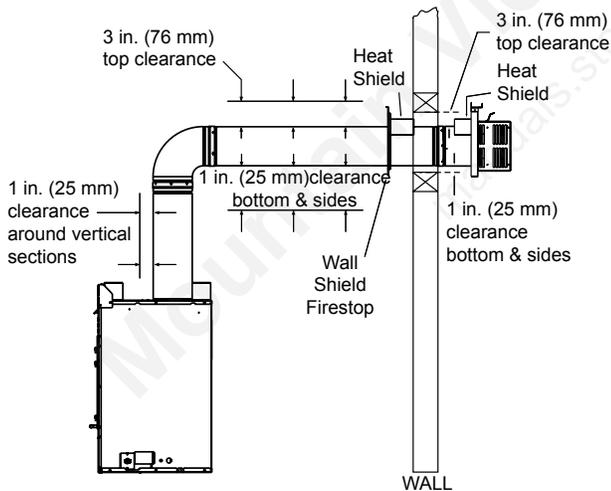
Horizontal Venting Clearances to Combustible Materials
